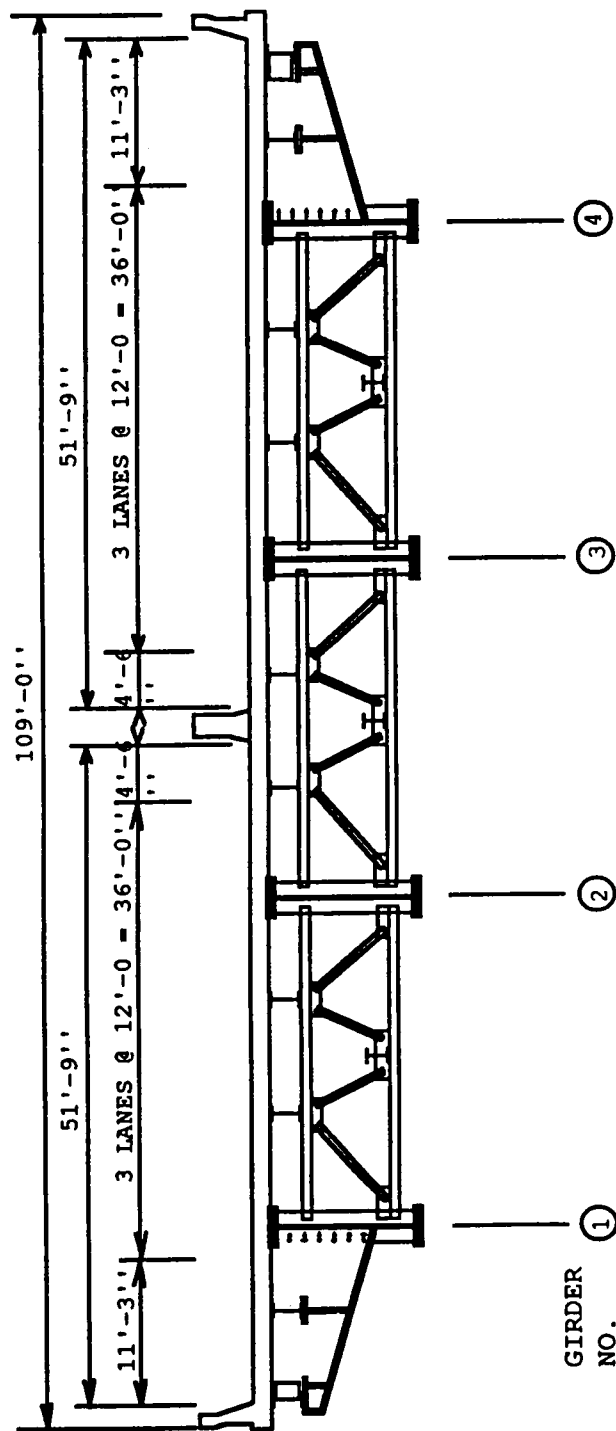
Cross-section of the HRB in the second span showing crossframes.
